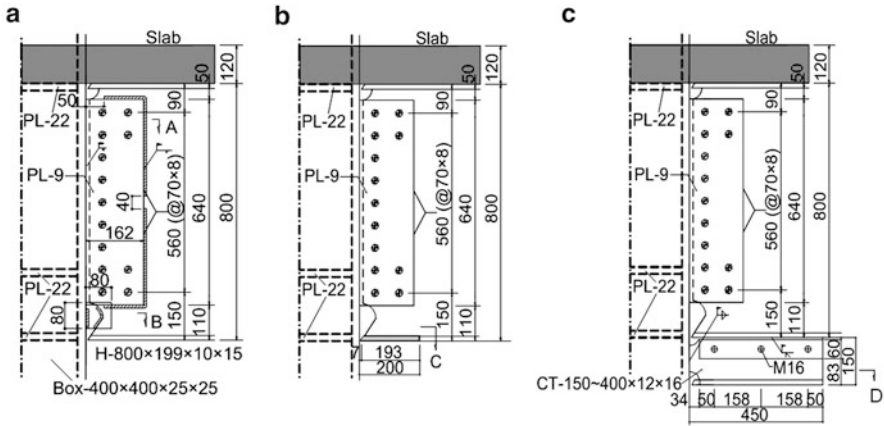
Reinforced field weld beam-to-column connections: (a) supplementary-web weld (SW) connection, (b) wing plate (WP) connection, (c) vertical haunch (VH) connection (unit: millimeters)
